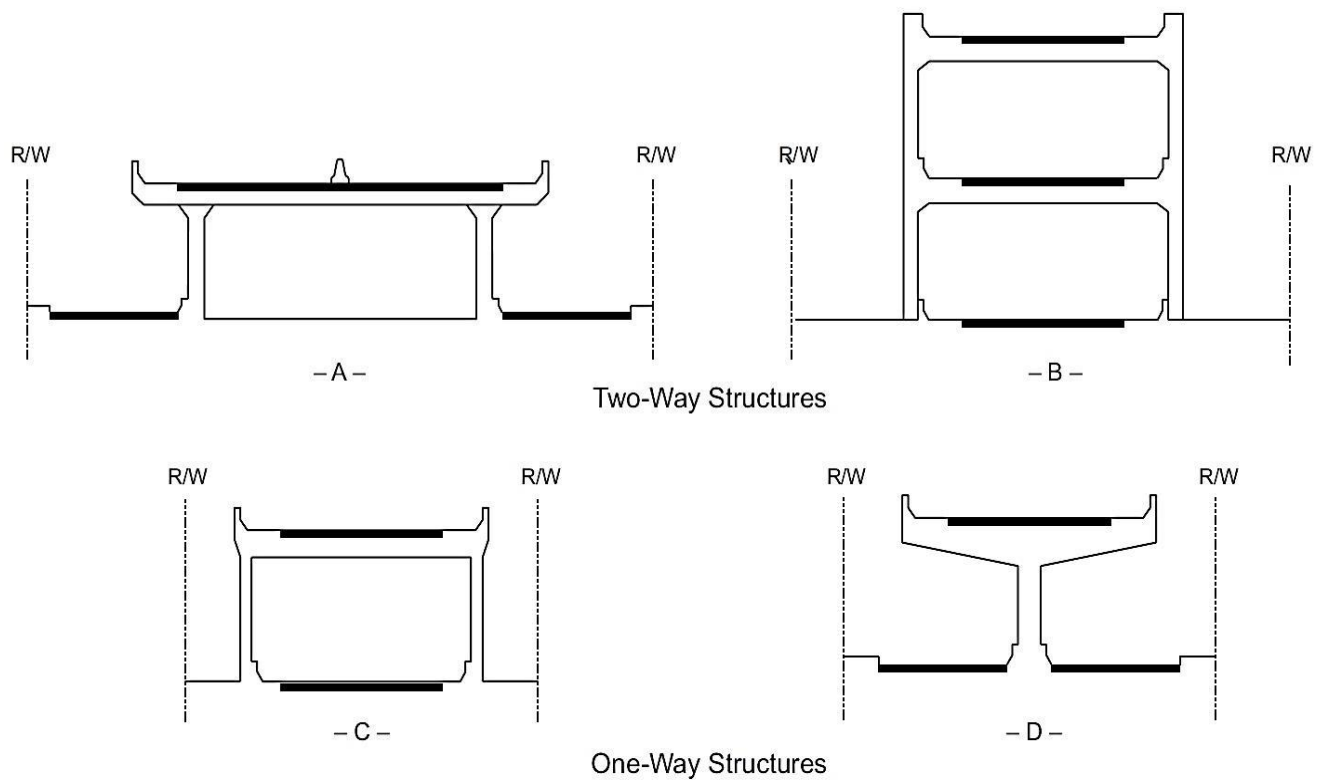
/4: Typical Cross Section for Elevated Freeways on Structures without Ramps [1, p.8-18]
